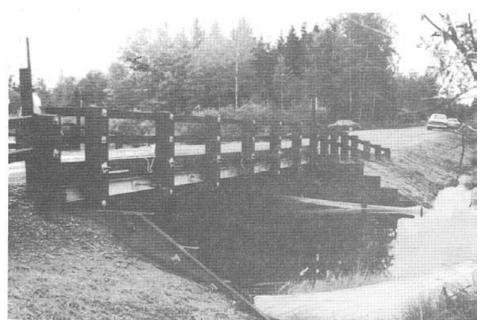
Stress-laminated deck bridge built over Iron River on the Cheguamegon National Forest in 1988.
